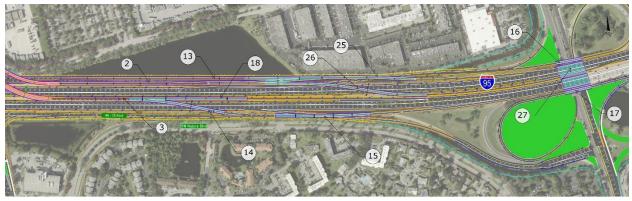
9: Proposed Bridge Location (2 of 3)
